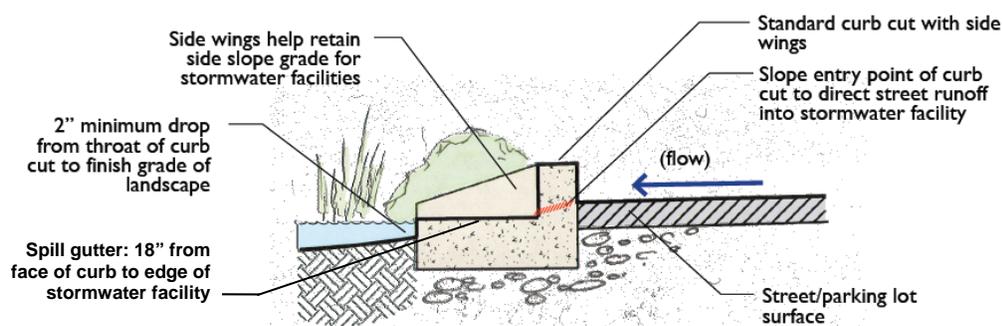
Standard curb cut with side wings: cut section view (Source: SMCWPPP 2009)
